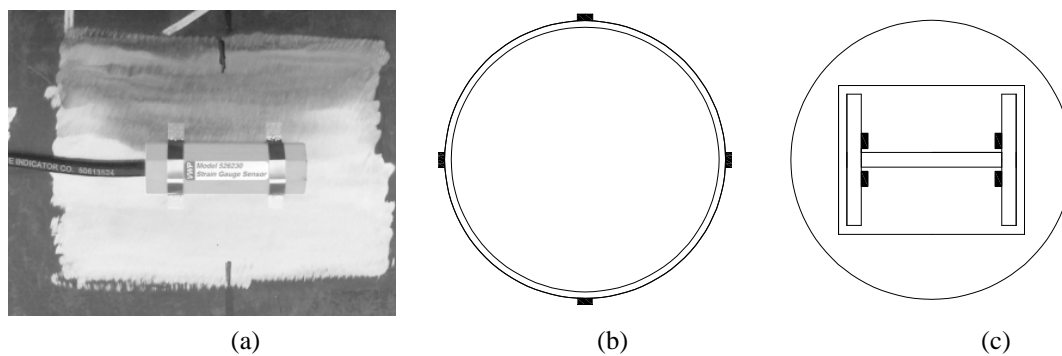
(a): Installed VWSG (b) gauge locations on a tubular prop and (c) welded channel section used at level 2.
